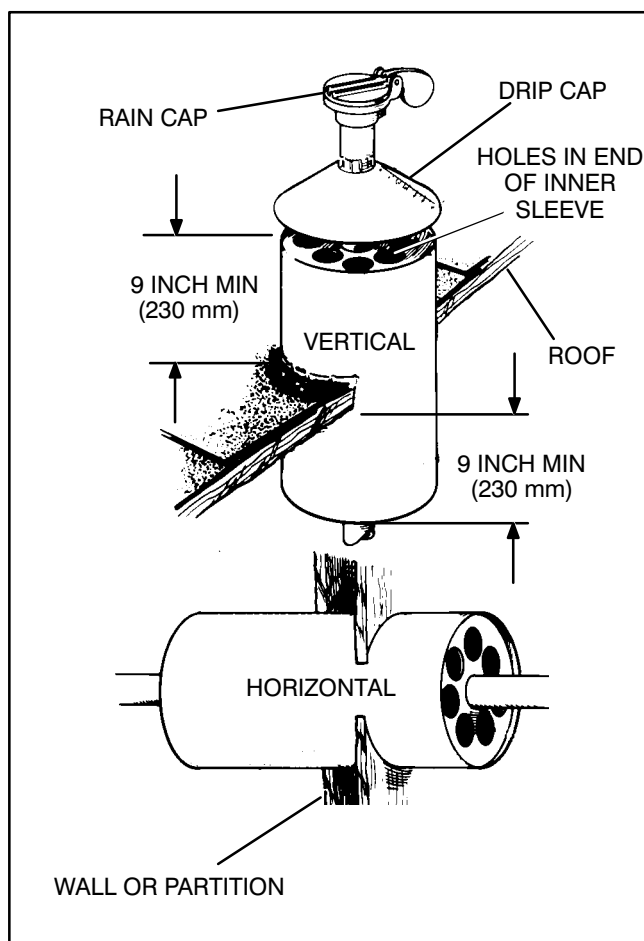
MOUNTING EXHAUST THIMBLE
